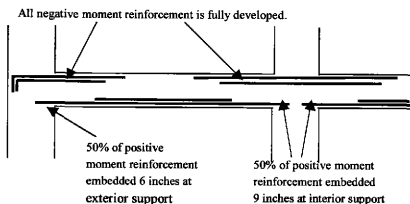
Details of Slab Reinforcement for Study Building [Adapted from ACI 318-83 (1983)]
